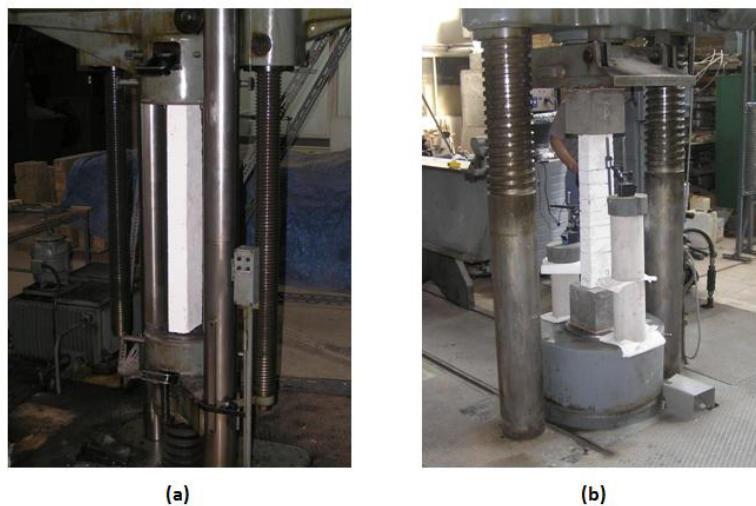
Test setup for application of: (a) Tensile loading, (b) Compressive loading.
